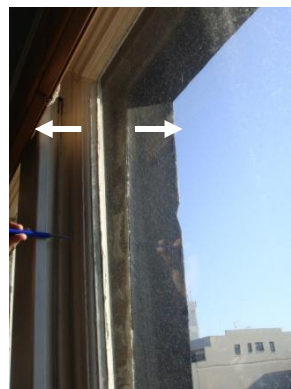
Caxton Press, 113 Victoria Street, facade wall pulled away from the side walls.
